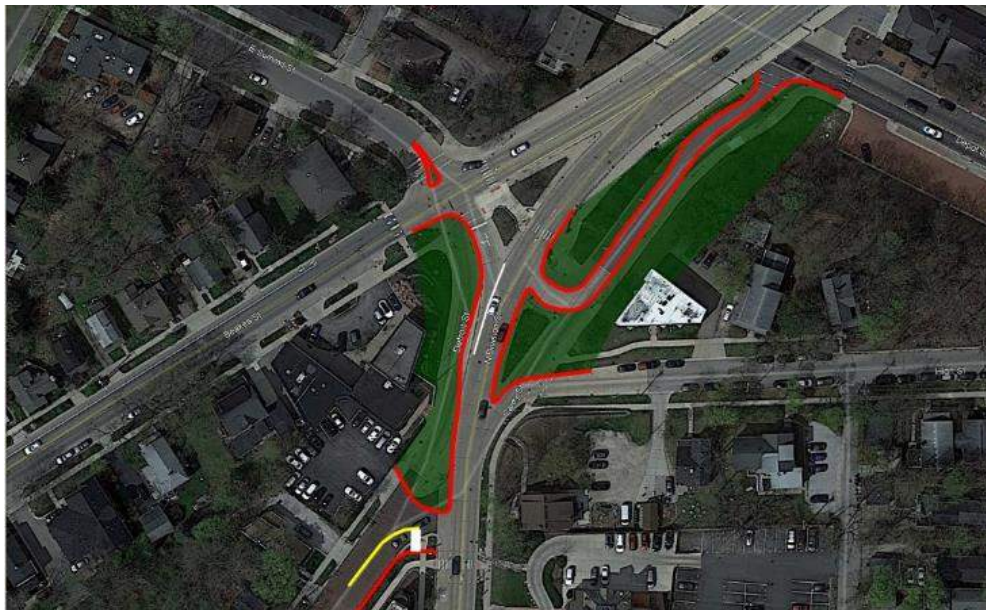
Option C – Close northbound entrance to Carey St from Division St and southbound access to Detroit St from Broadway St/Summit St. Maintains access from Division to Summit. Left turns and thru movements would be channelized. Would maintain access to the Broadway Street bridge from Depot Street and to High Street from Division.
